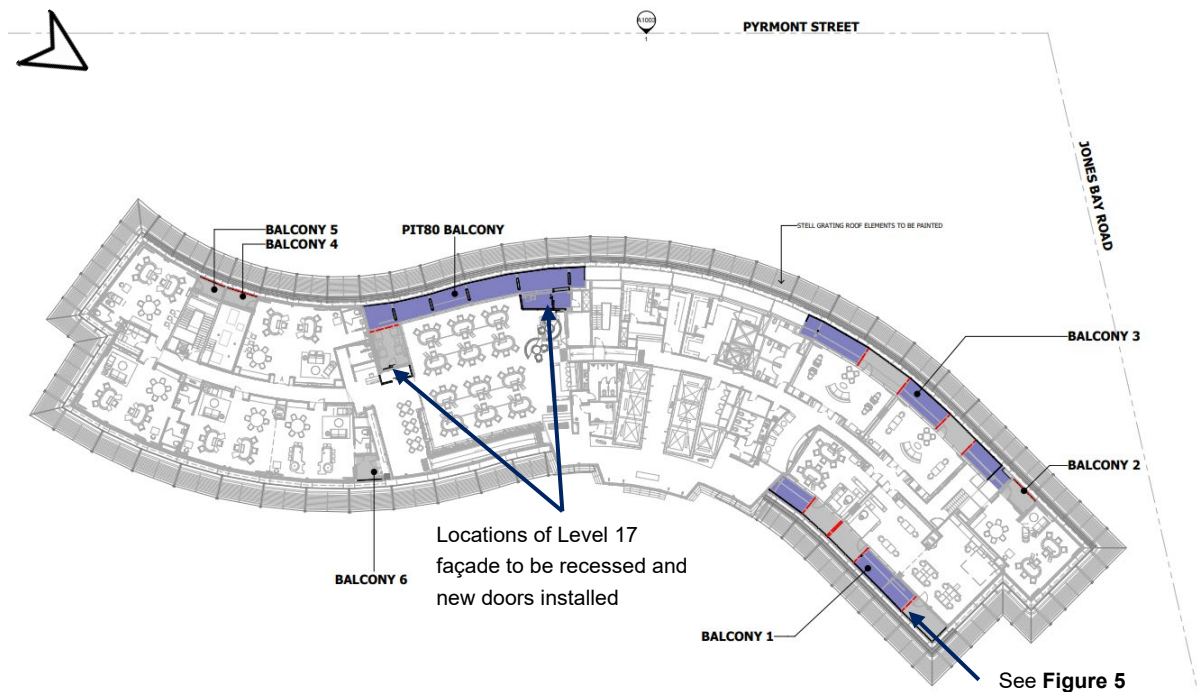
| Proposed balcony expansions in The Star Grand Hotel (Source: Architectural Plans)
